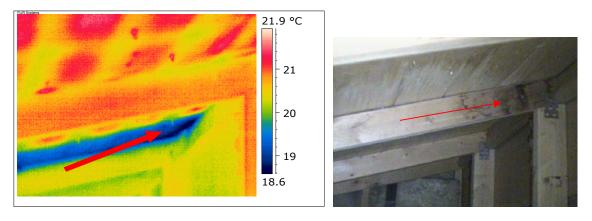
Captured at: (Suite 15 Basement Sub-Floor)
